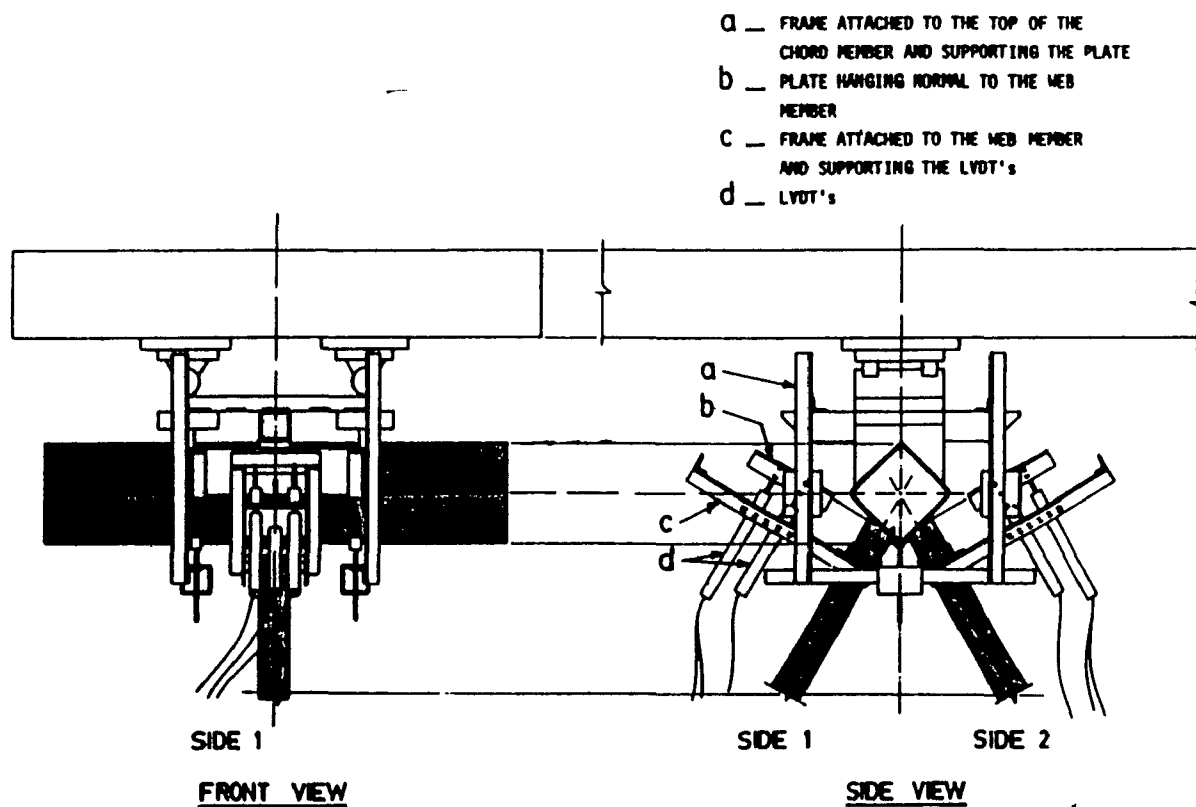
LVDT arrangement for measuring the joint deformations. Joint tests.
